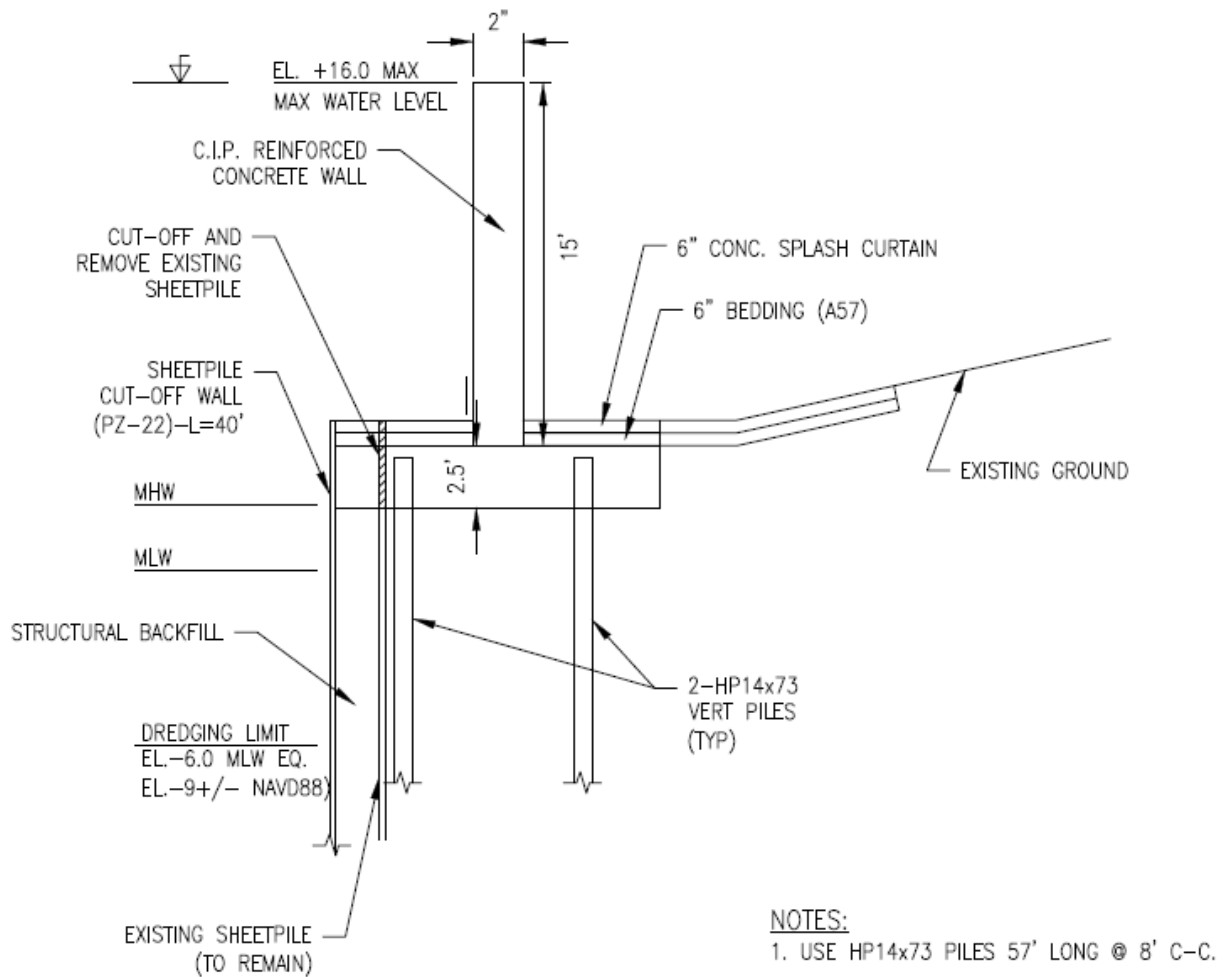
Typical Section – Concrete Cantilever Wall – Type C
